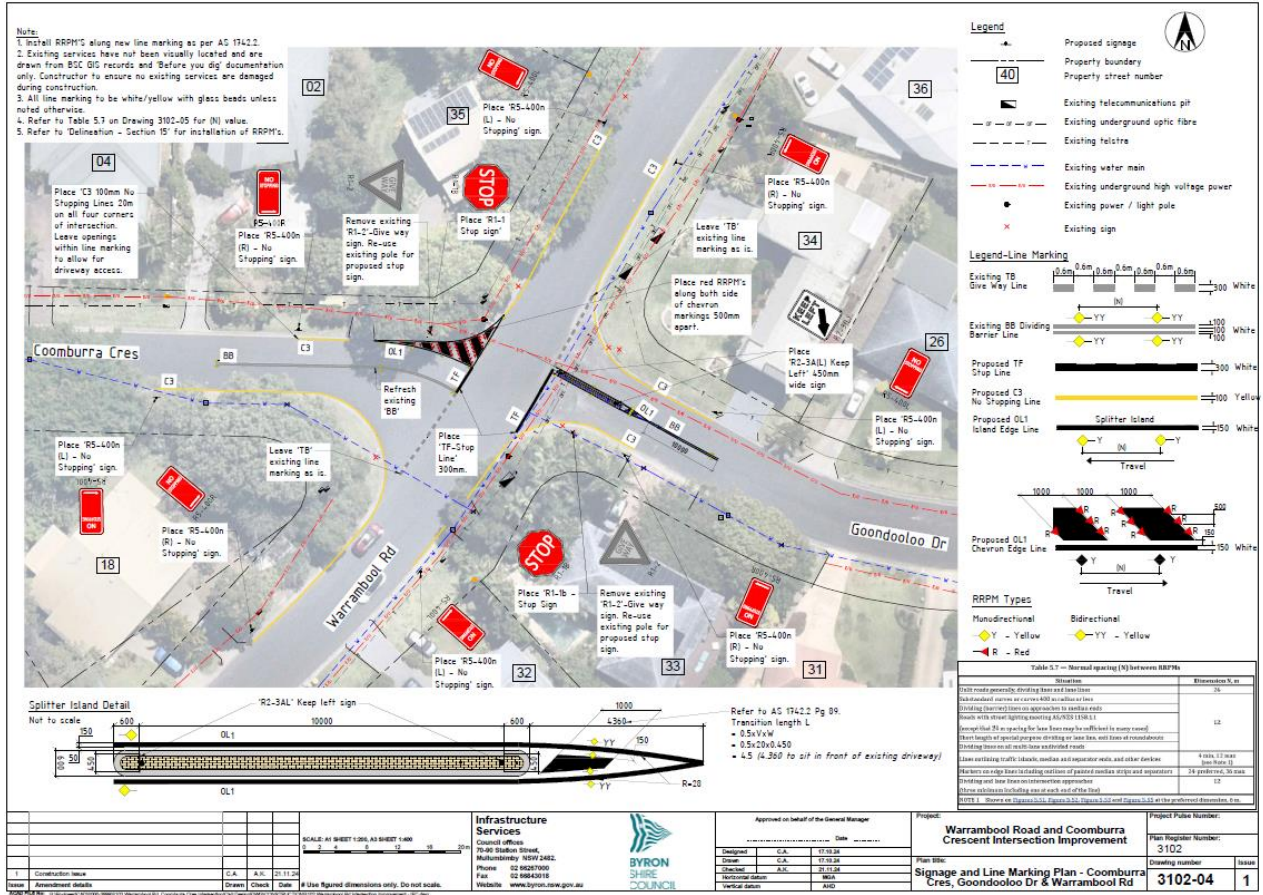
new proposed intersection layout (sheet 1 of 4)
